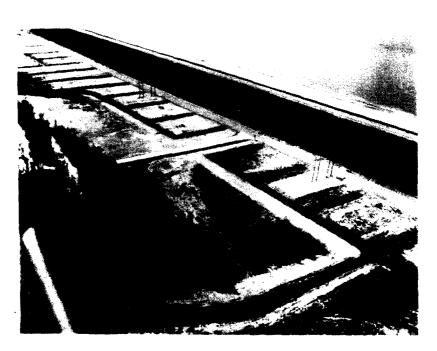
Aerial view showing relief well discharge and collector ditches. Discharge ditch for relief well No. 19 is pictured in extreme right of photo. 8 May 1957.
